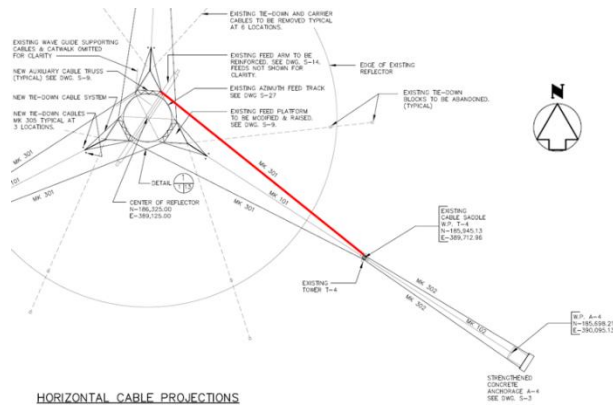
Horizontal Cable Projections, Drawing S-1, highlighting Failed Aux M4N Cable in Red
